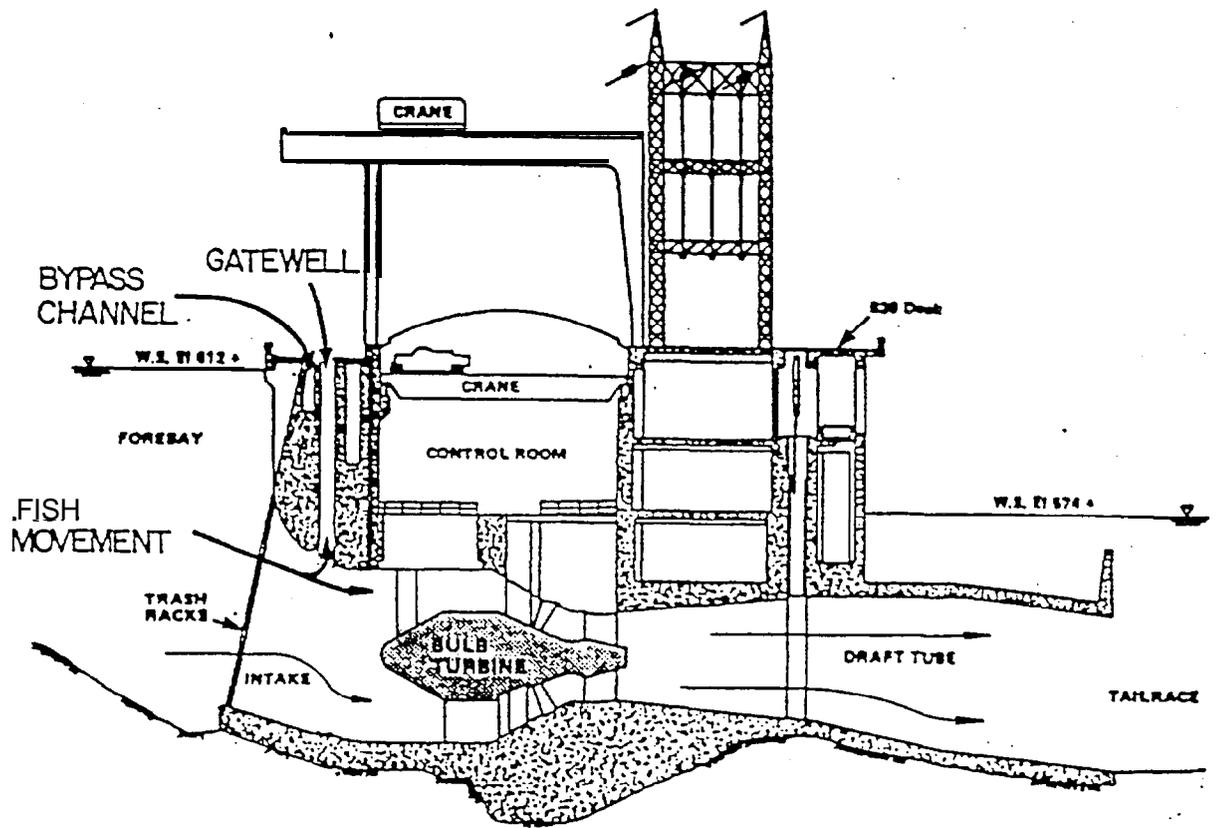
Section through Rock Island Dam second powerhouse indicating fish movement into gatewell system.
